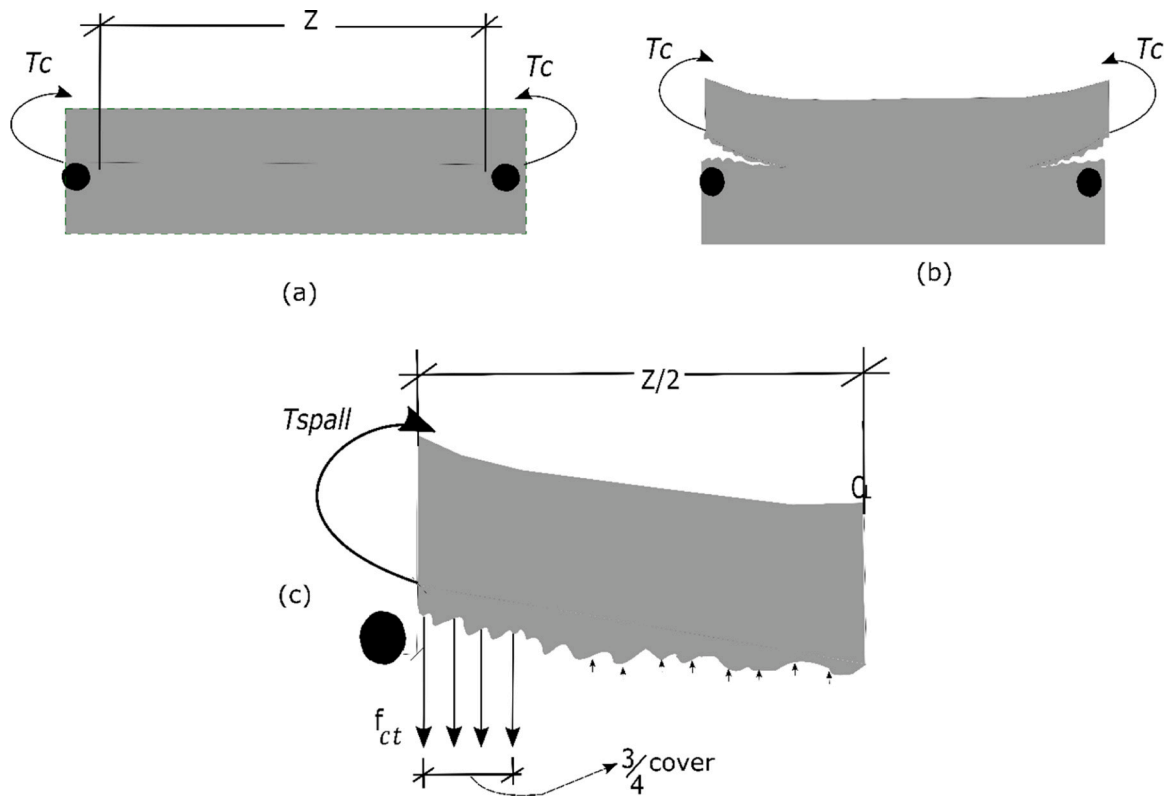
(a) Concrete cover under a spalling moment (b) gradual spalling (c) Spalling resistance at the initiation.
